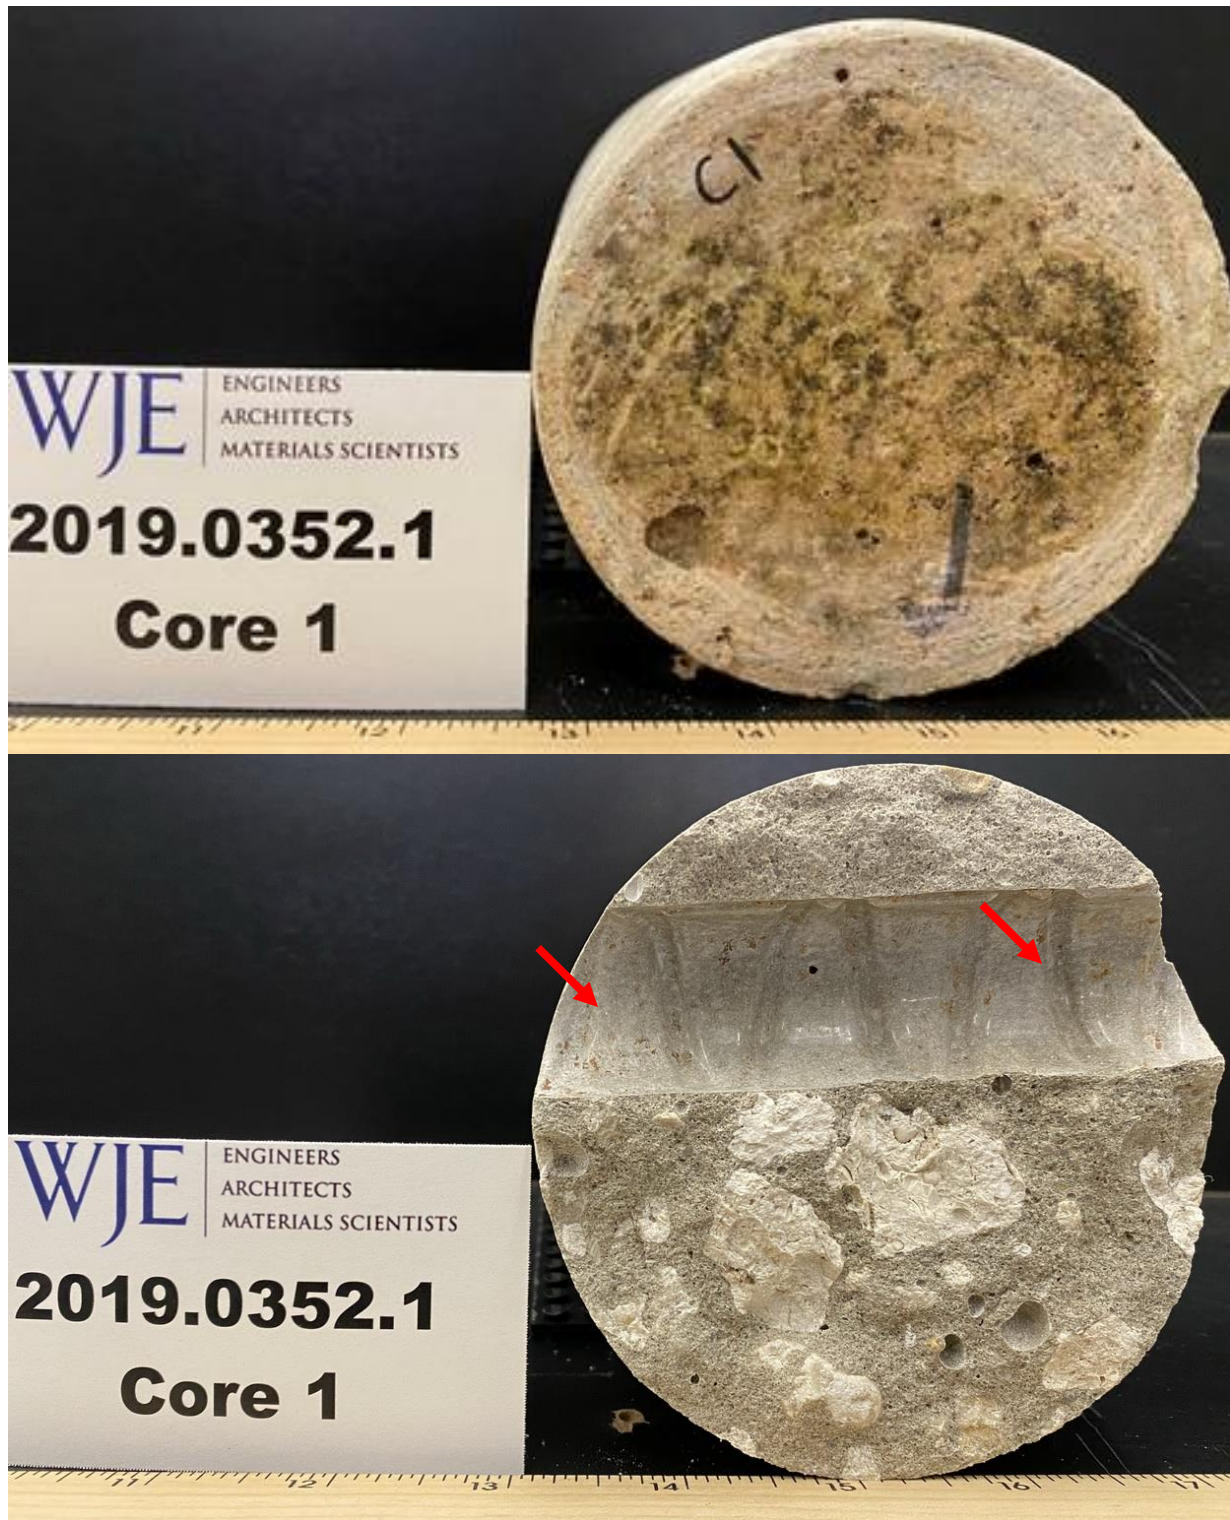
Core 1. Exterior (exposed) surface (top photo) and interior surface (bottom photo). Arrows indicate imprint of coated deformed steel reinforcing bar, with essentially no to minimal stains or corrosion rust. The fractured surface extended mainly through coarse aggregate particles, consistent with a tight paste-aggregate bond. As-received.
